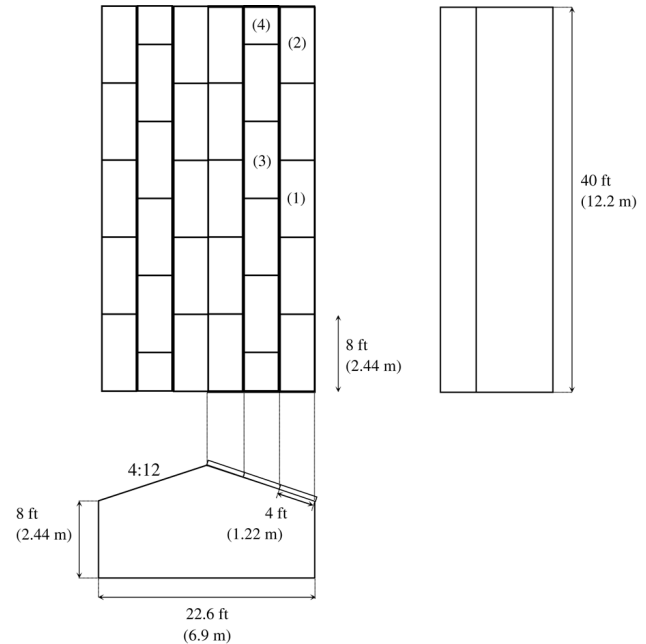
Dimensions and panel layout showing four panel locations, Structure Type 1.
